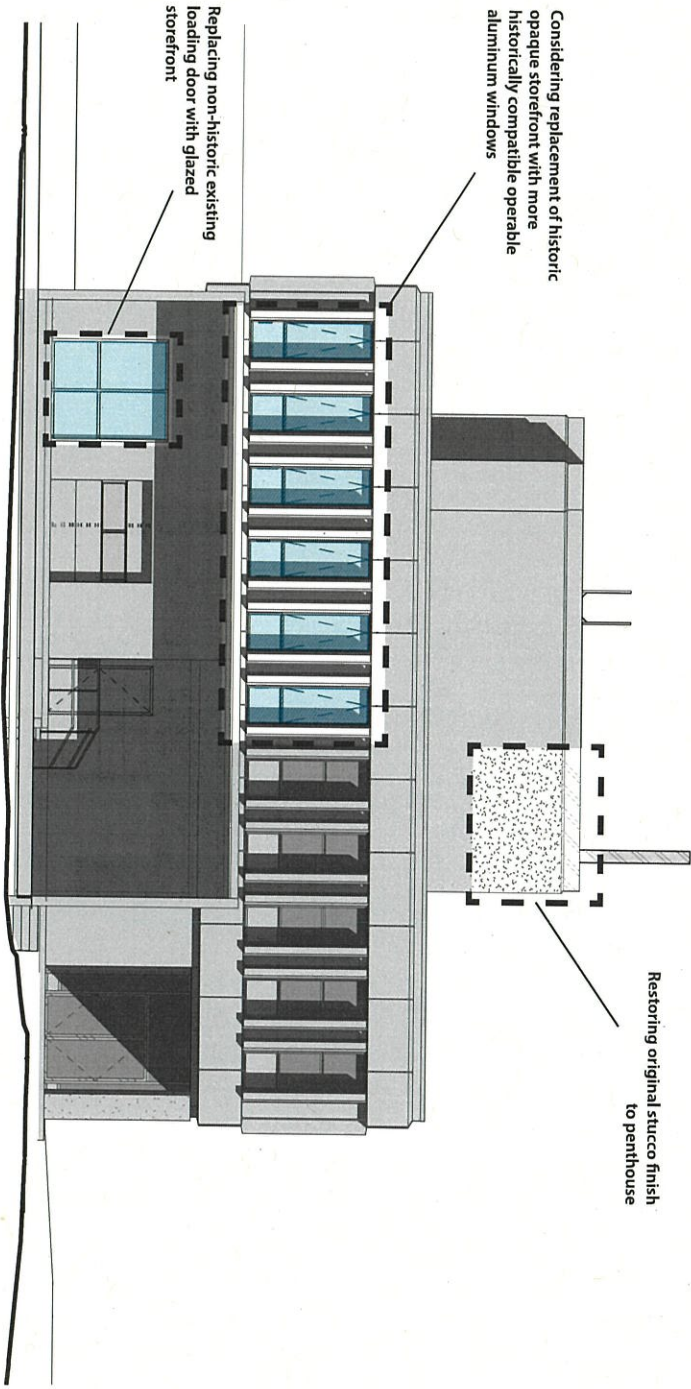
NORTH ELEVATION - PRELIMINARY DESIGN
